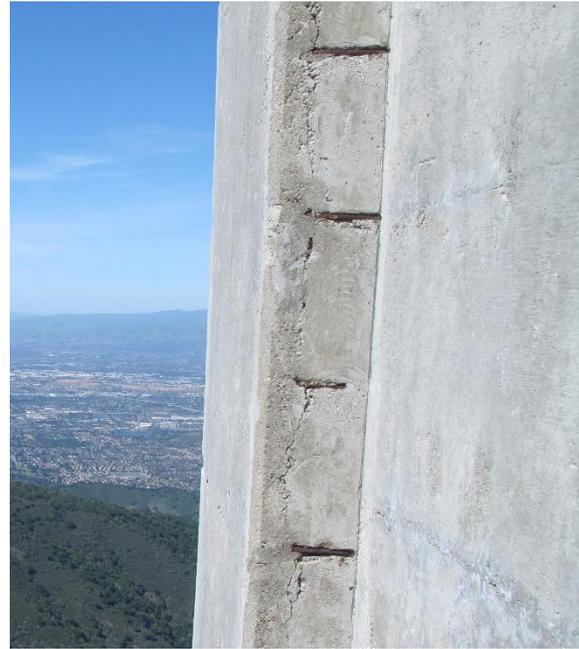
Concrete spalling on side of pilaster due to inadequate concrete cover.
